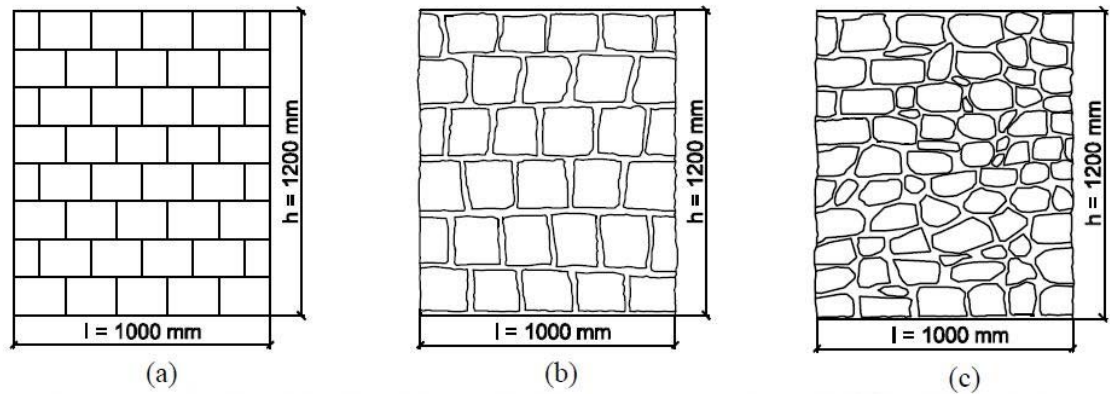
Geometry and bond details of Vasconcelos walls; (a) sawn stone units walls, WS; (b) irregular walls, WI; (c) rubble walls, WR
